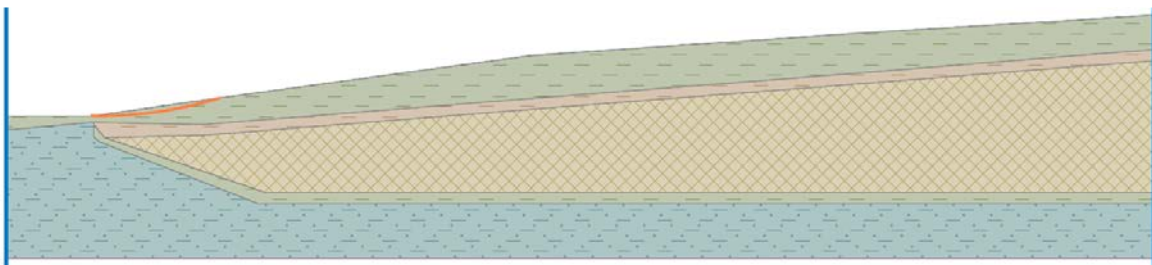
Section 2-2, $r_u=0.1$, shallow slump
